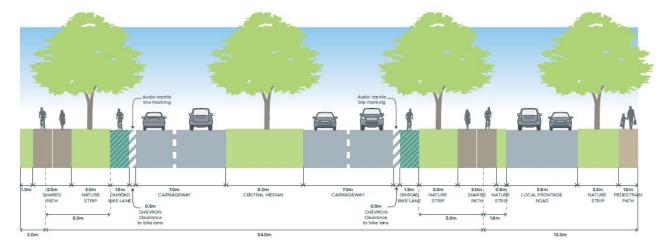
Boulevard Connector Street Cross-Section (west side of IN-02 and both sides of IN-03)
